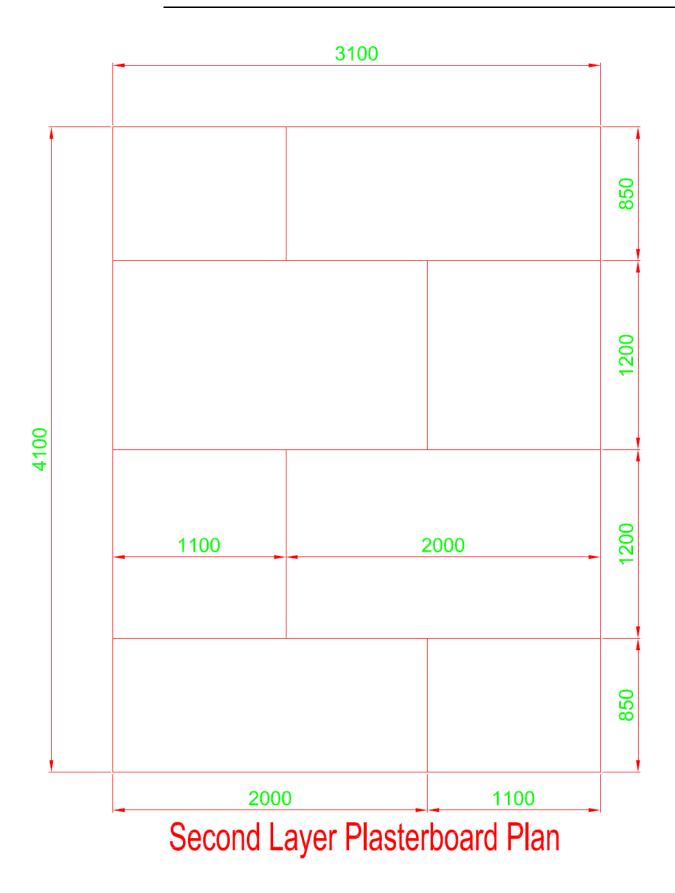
Second (Outer) layer view of exposed side of the test specimen.
